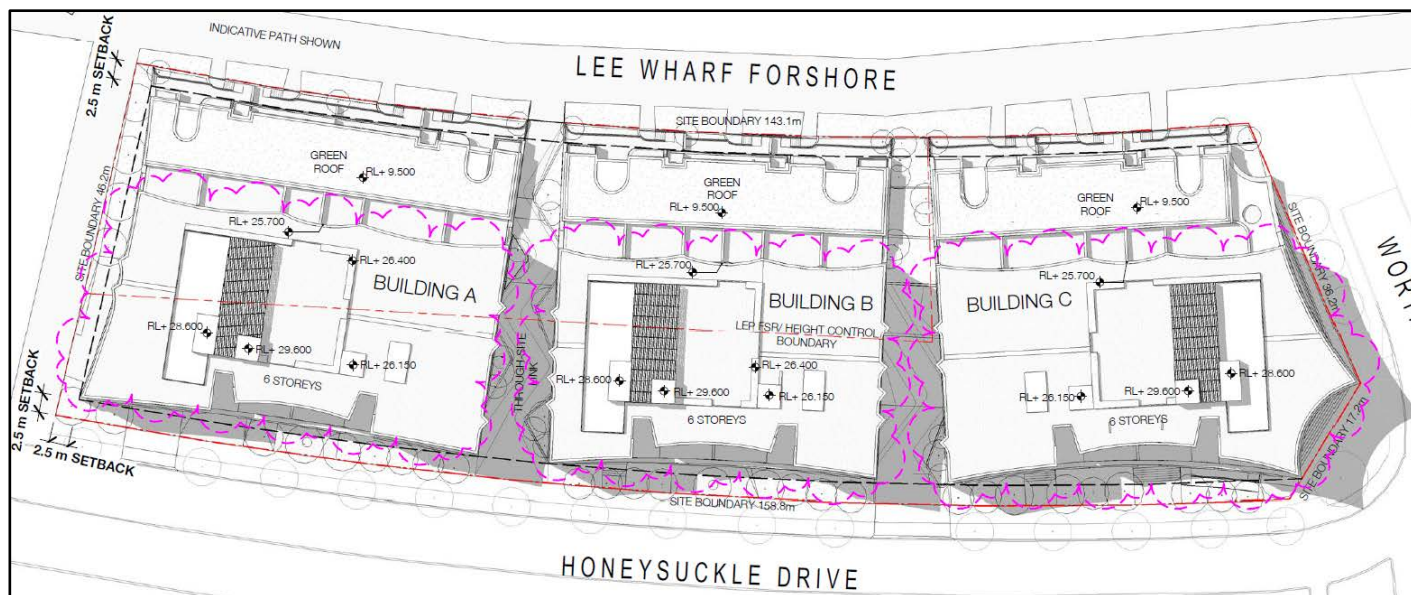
| Approved Site Plan (Source: DA-0103 Rev 13). Note: SSD Approval Condition B2 requires the removal of the rooftop area and associated elements on Building C
